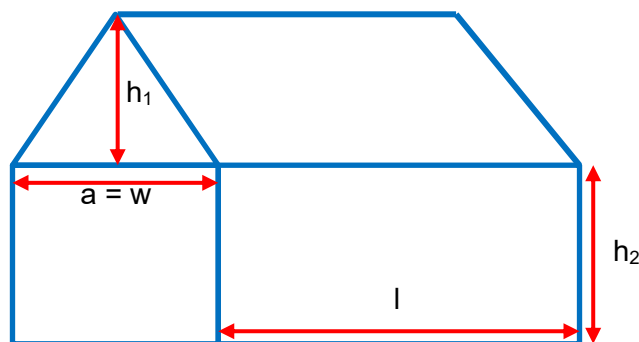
Glasshouse sketch (source: Author, 2020).
